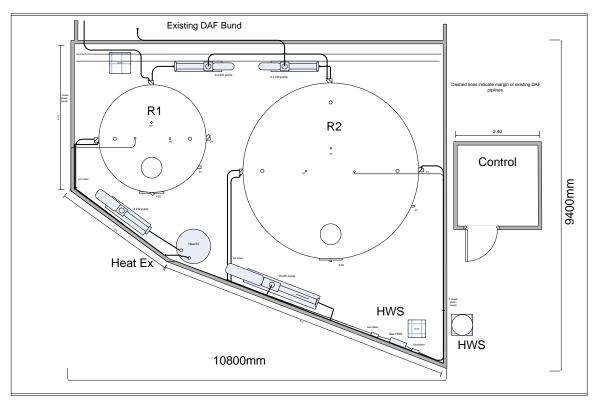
Layout and footprint of TPAD demonstration plant installed at an Australian Meat Processing Facility
